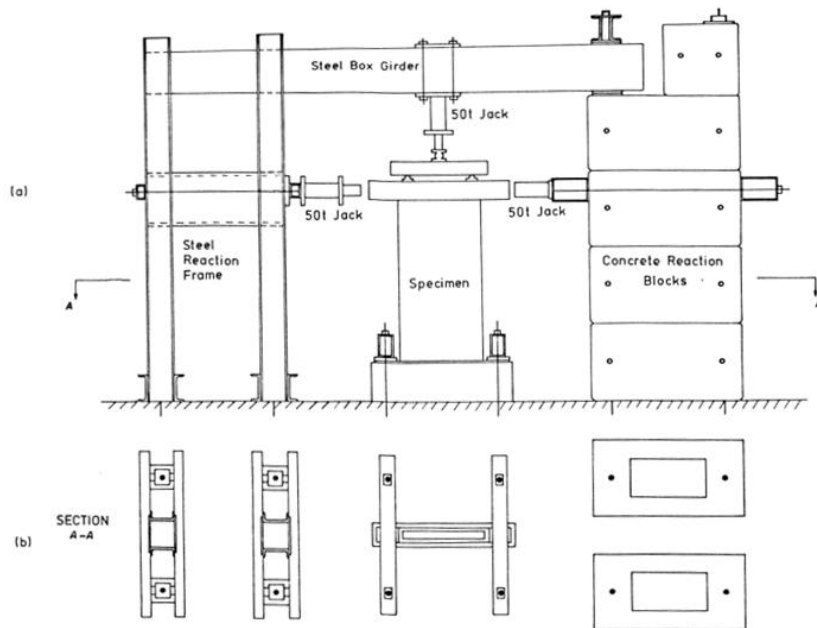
SCHEMATIC REPRESENTATION OF THE TEST RIG (A) ELEVATION, (B) PLAN VIEW^[206].
